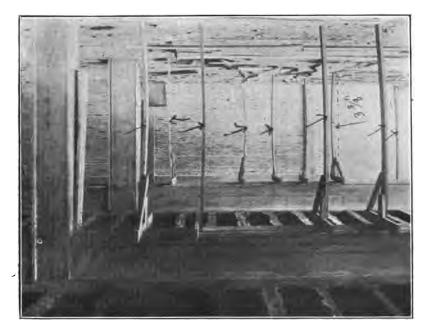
Second floor, note conditions of posts left under girder. Supports taken out from under slab. Girder 36 ft. long, 21 in. deep and 14 in. wide below ceiling. 2 in. by 6 in. posts below girder spaced 2 ft., 6 in. apart. Posts 11 ft., 0 in. long. All are buckled from 24 in. to 34 in.
